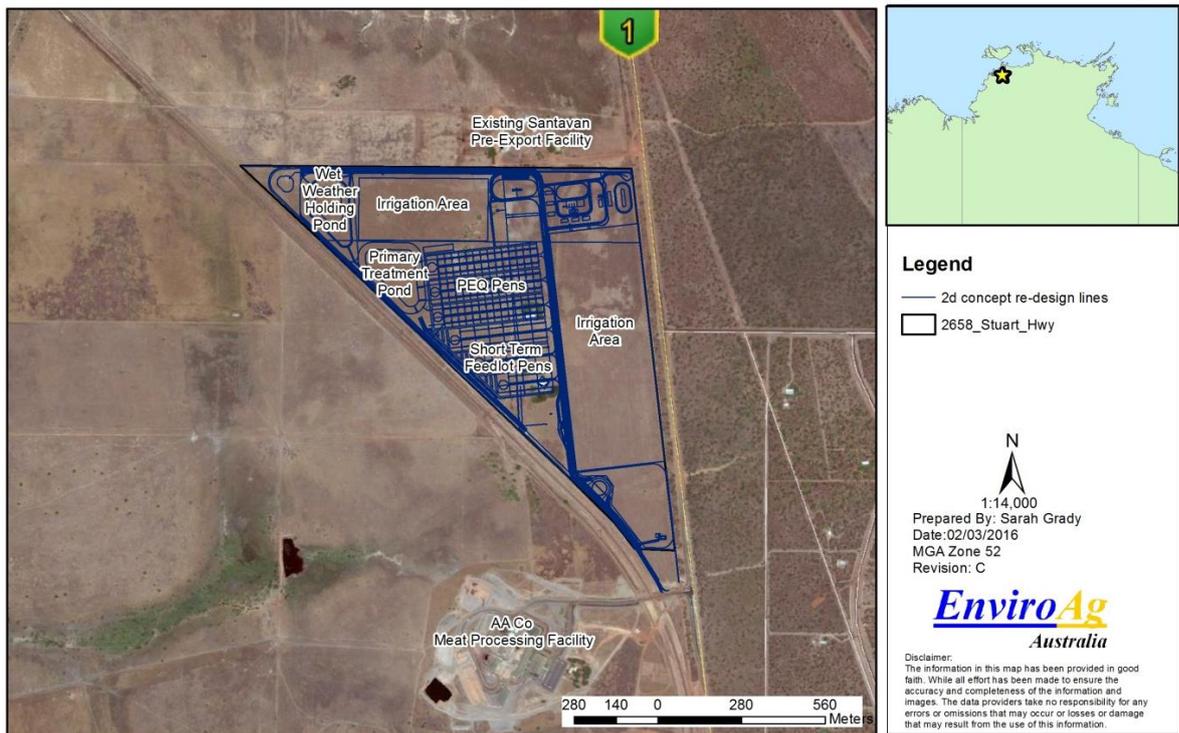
Site arrangement of the facility in relation to adjacent land uses.
